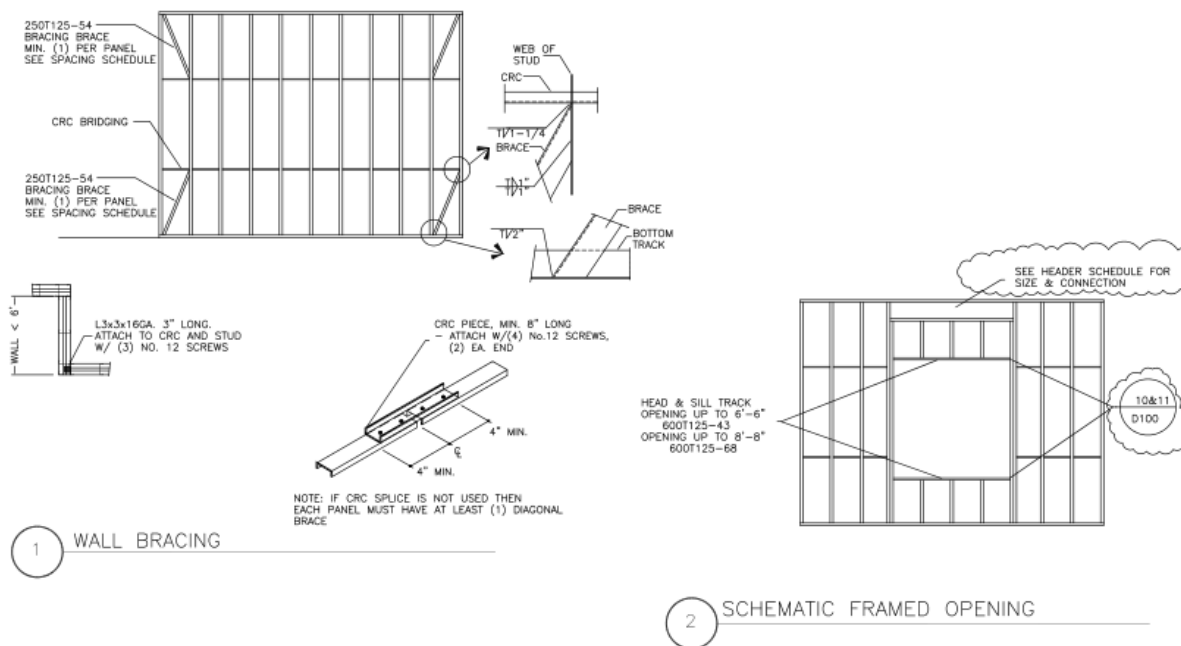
From Structural Sub drawings C200. It is the only hint of Bearing Wall components/design shown from the Infinity System.
